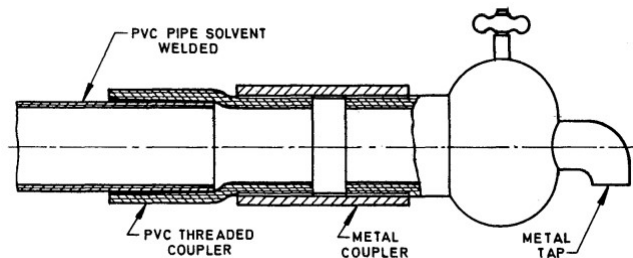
Connection of PVC Pipe to Metallic Water Taps
